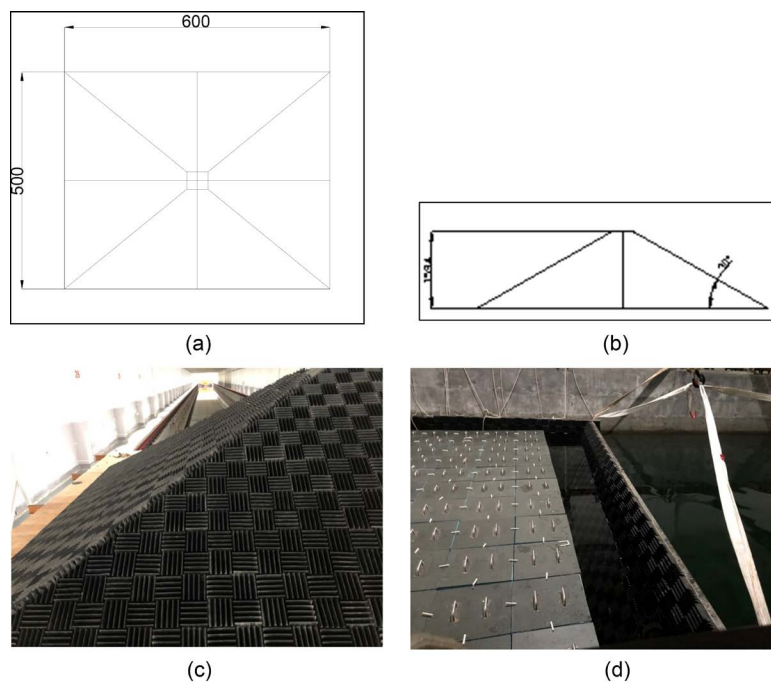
Design drawing and actual drawing of quadrangular pyramid structure. (a) Top view; (b) Main view; (c) Before entering the water; (d) Entering the water
